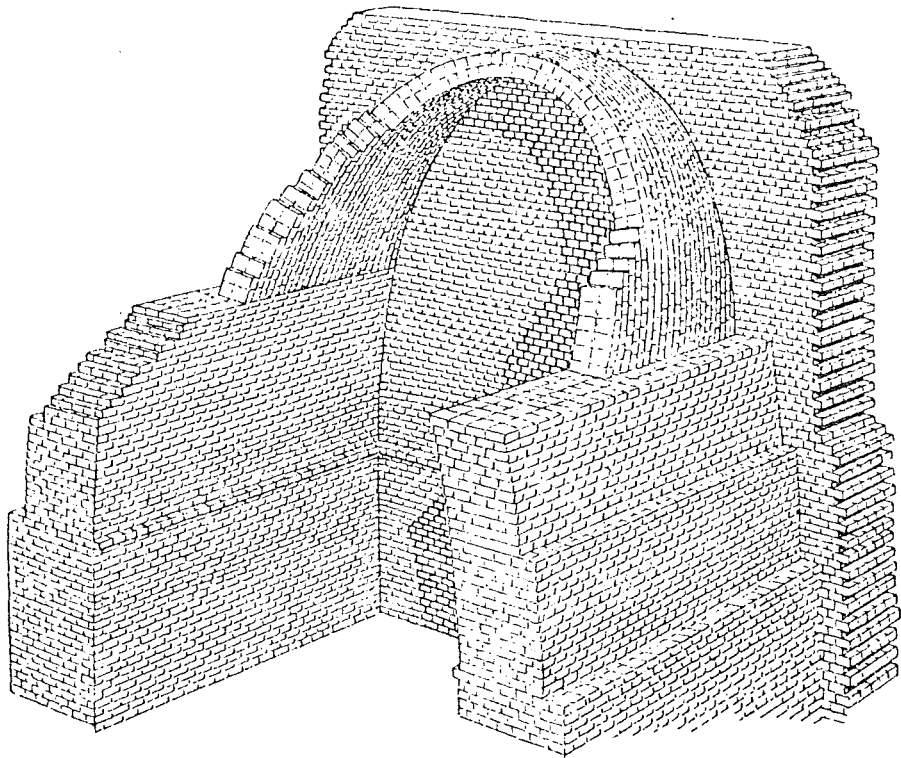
Diagram of a Sāsānian barrel vault with parabolic cross-section, built without centering, with vertical semicircular courses.
